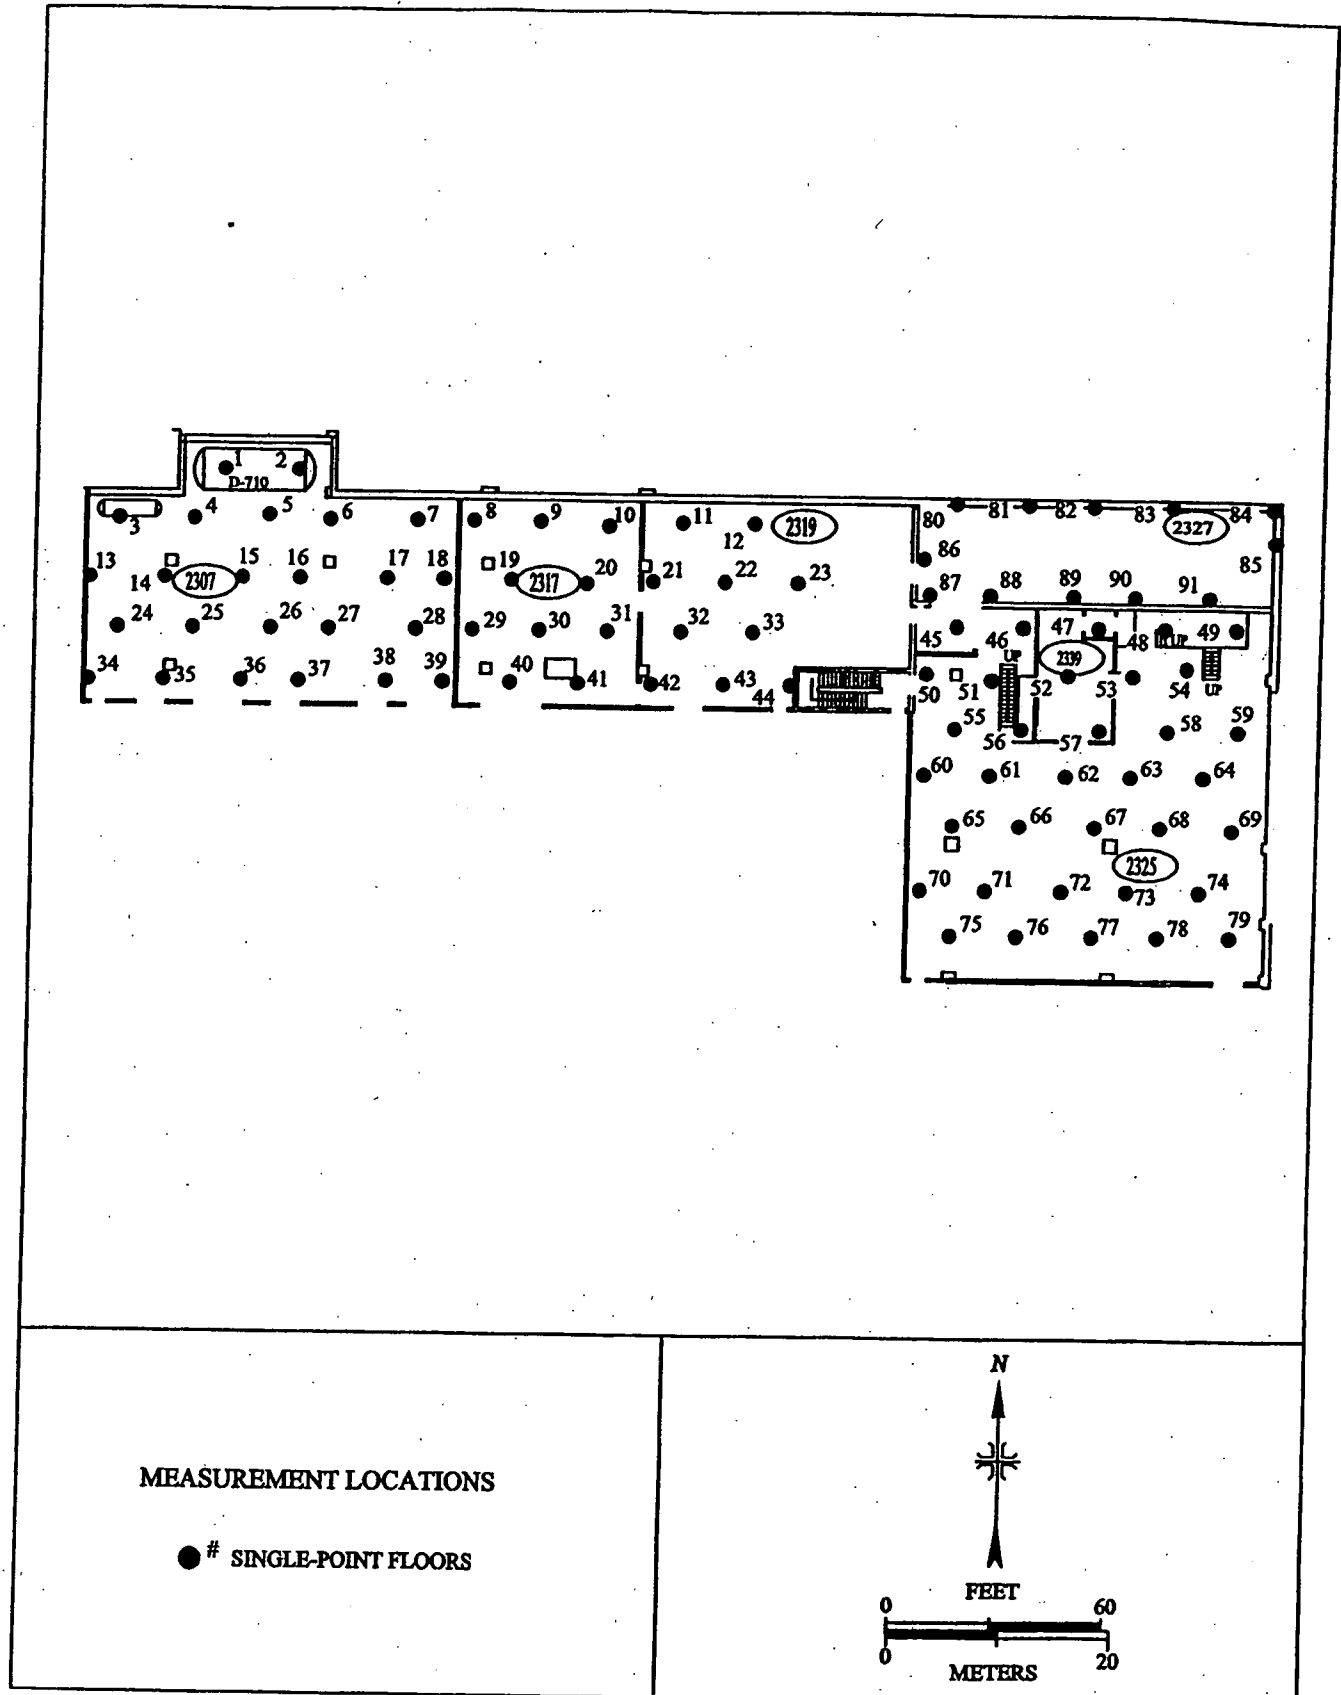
Building 371, Survey Area D - Measurement Locations
